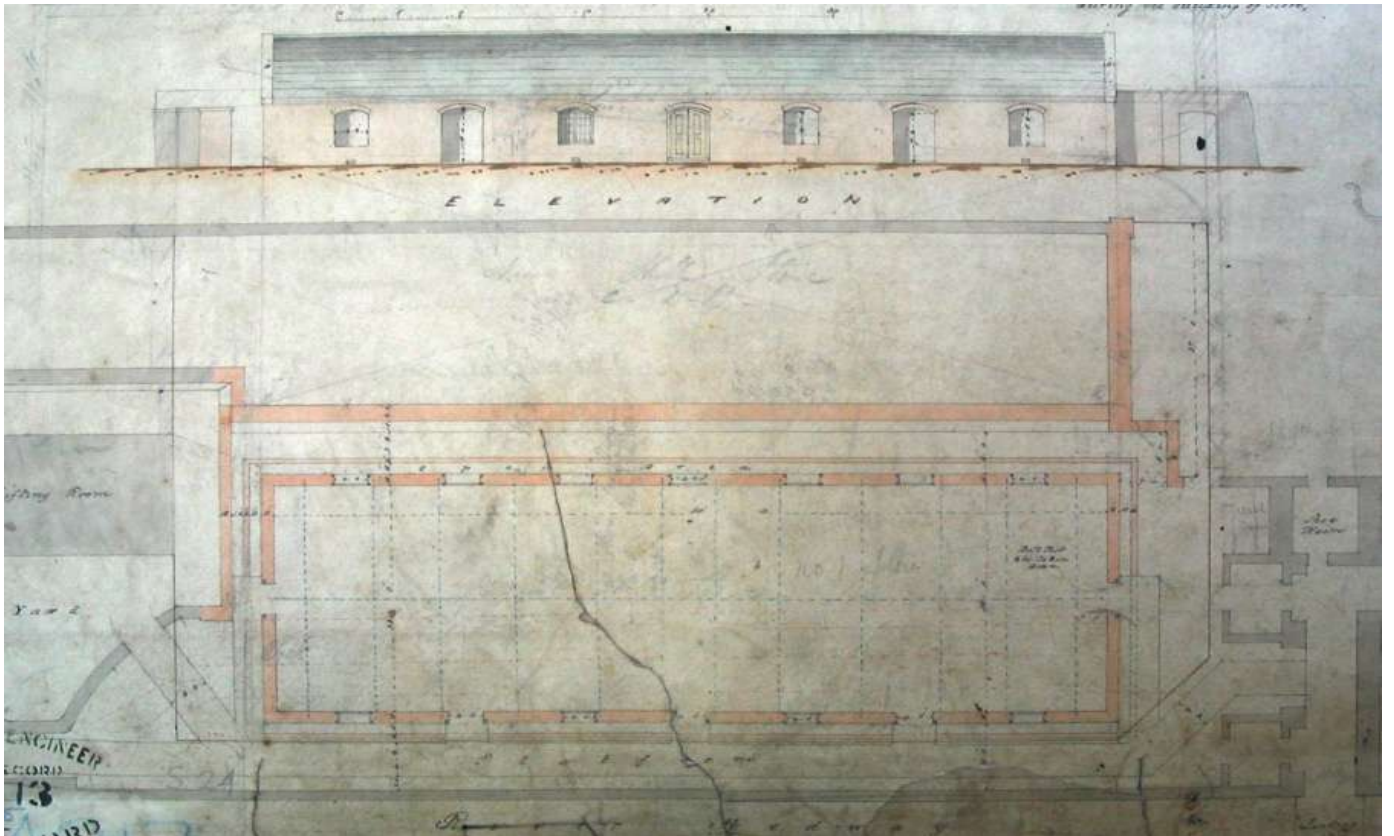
Plan of 'B' Magazine (AD 10/420/SE/2/0558)
